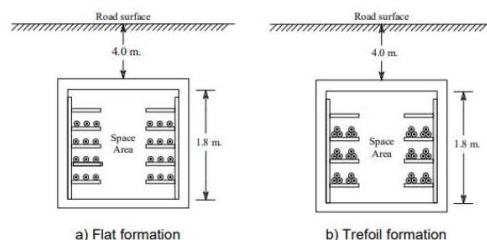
Cable arrangement of square tunnel for the underground power cable installation
